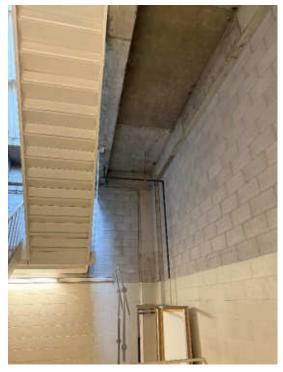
Southwest Stair Well. Concrete Structure with Metal Staircase
